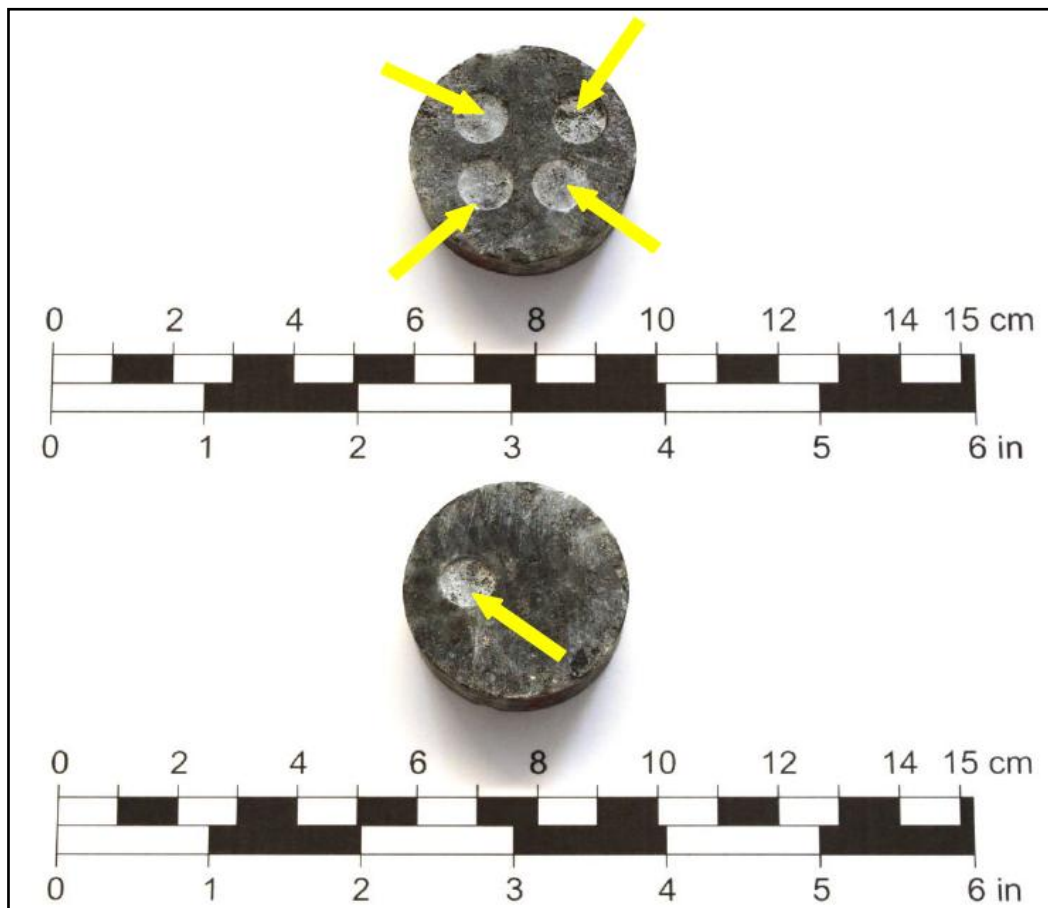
Test piece from Sample 3 after drilling. Drillings done on both sides of core piece
